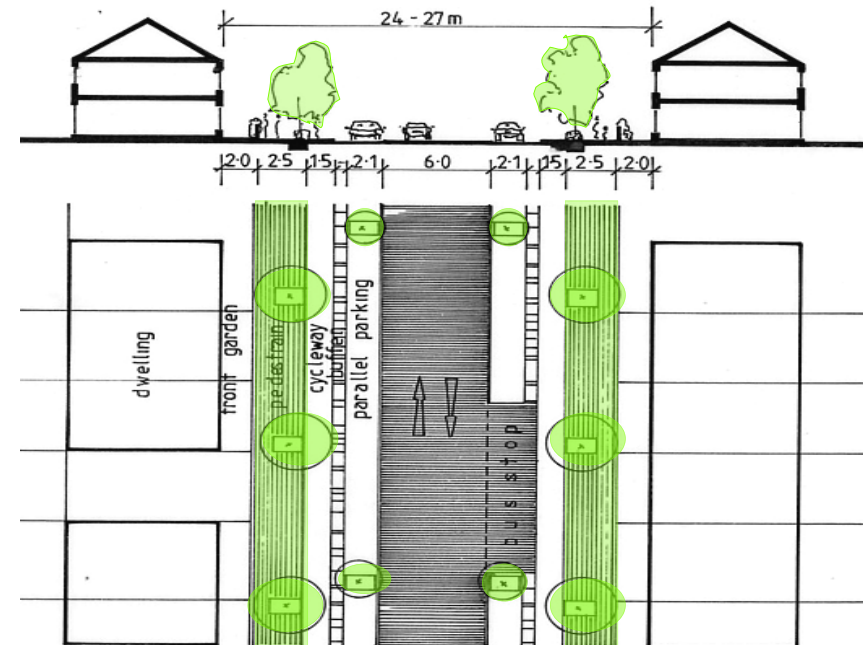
B | Indicative Plan and Section of New Village Street
